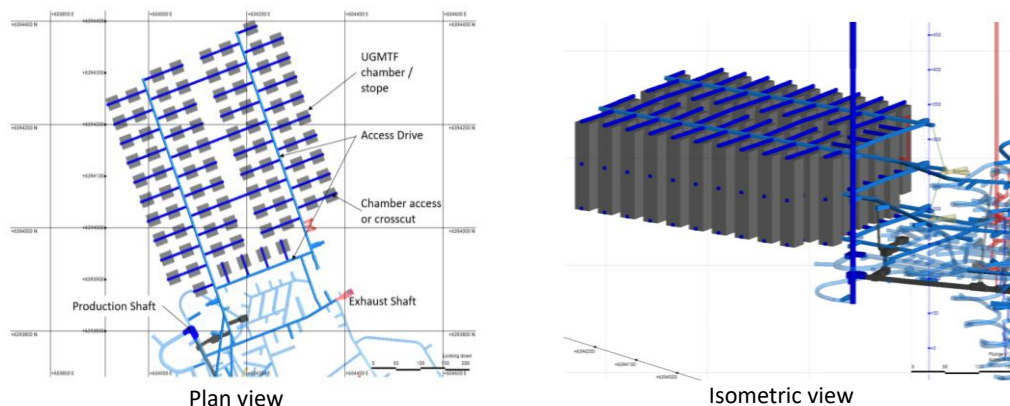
Plan view and isometric view of the UGTMF in relation to other underground mining infrastructures (source: NexGen -Rook I Project Geotechnical Assessment)
